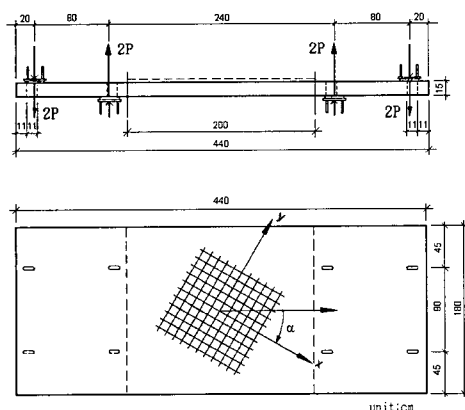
The specimen under uniaxial bending tested by Iványi-Lardi [unit:cm]
